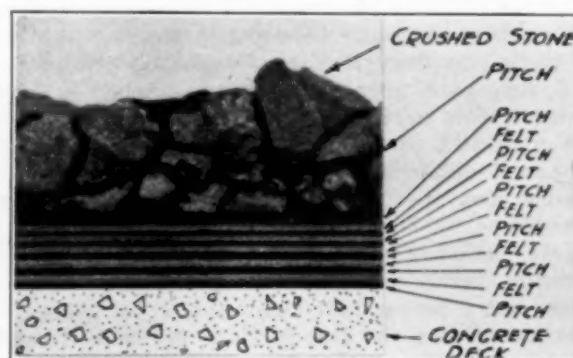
GRAVEL ROOF APPLIED ON CONCRETE DECK. ILLUSTRATION ACTUAL SIZE
